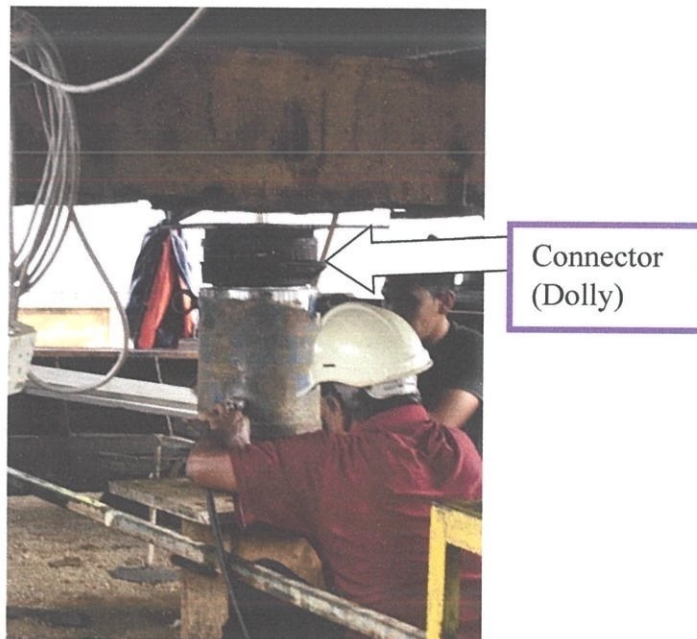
Connector (dolly) under the Hydraulic Jack In Pile
